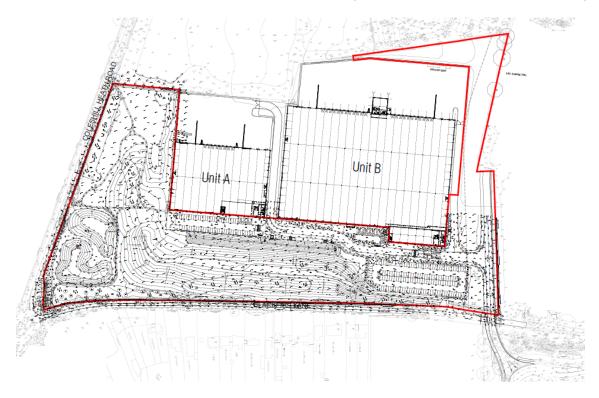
EXTRACT OF LOCATION PLAN (DRAWING REFERENCE: 6632 – 012)
